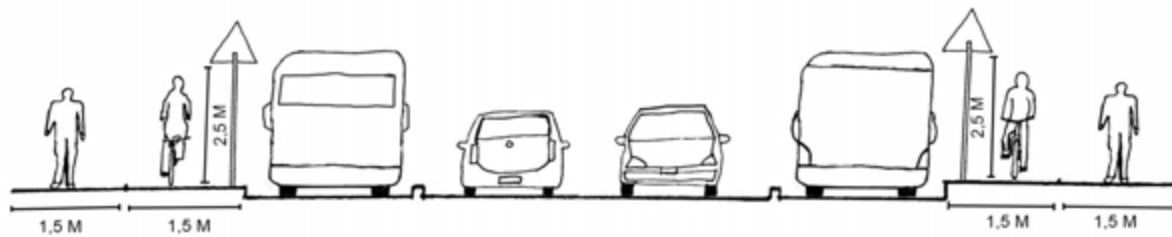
Secondary NMT routes with IRT in section (Source: Author)
